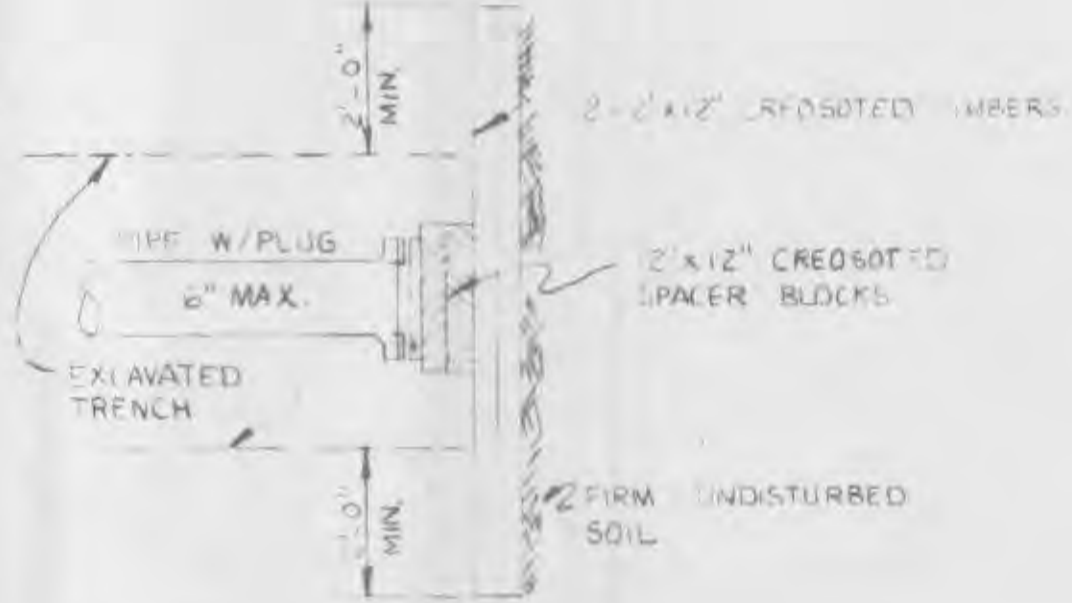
DETAIL THRUST BLOCK FOR VERTICAL OFFSETS
